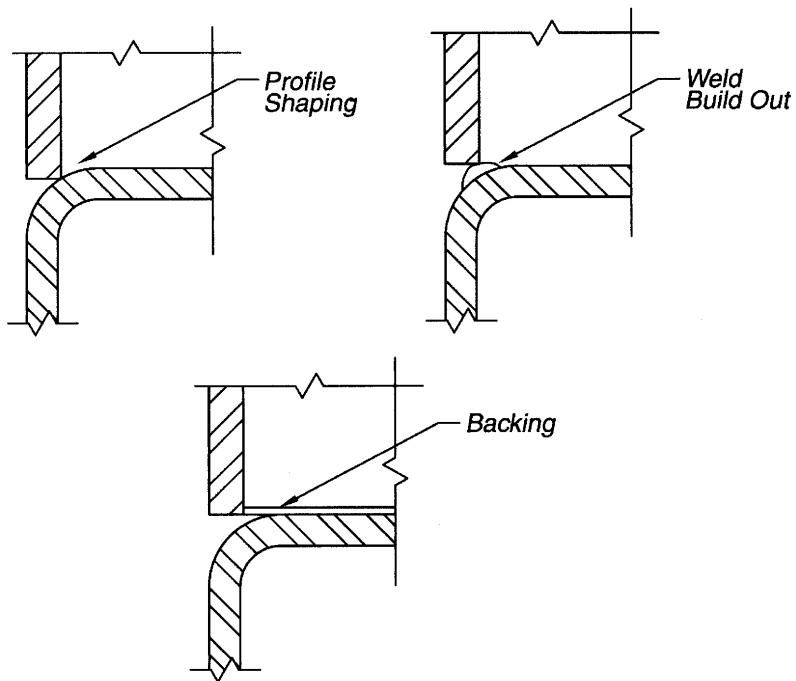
Welding methods accounting for the HSS corner radius.
